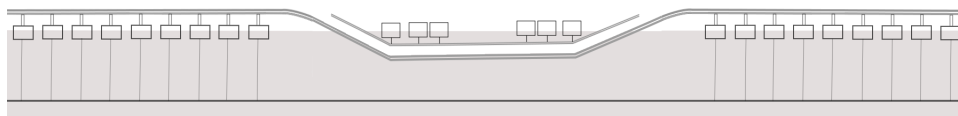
A simplified illustration of the floating bridge and tunnel connected to pontoons.
